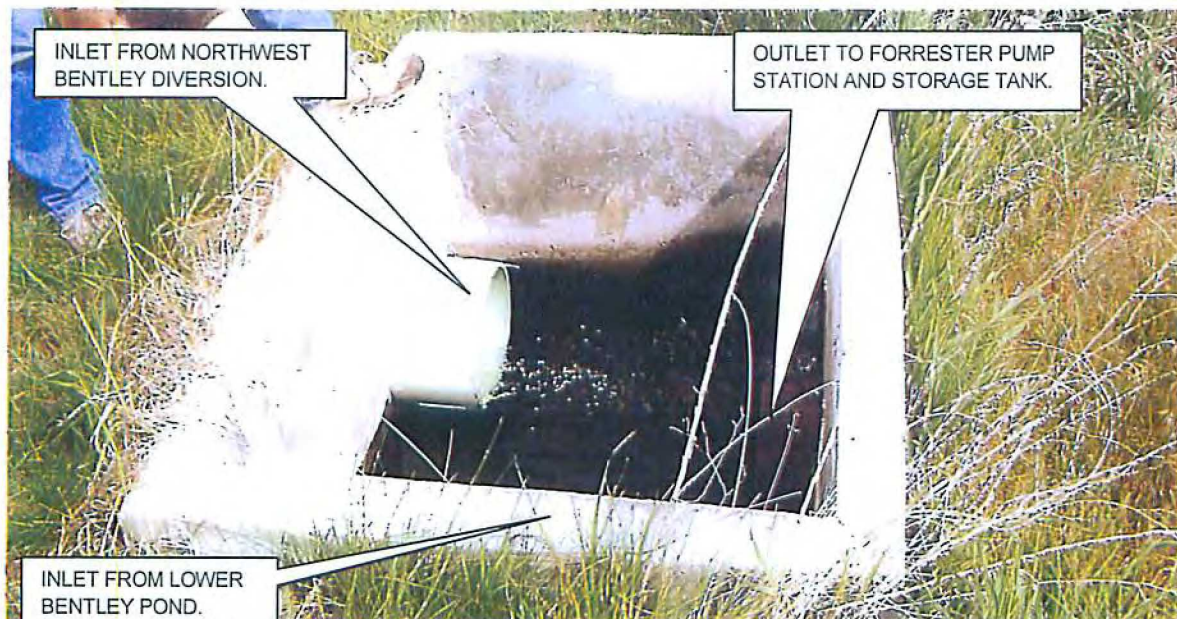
Diversion box on the Bentley that transfer's water from the northwest Bentley diversion box and the northern outlet of the lower pond.
